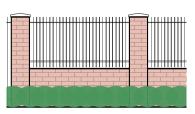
Permeable fencing – brick pier and low wall with permeable infill panel
